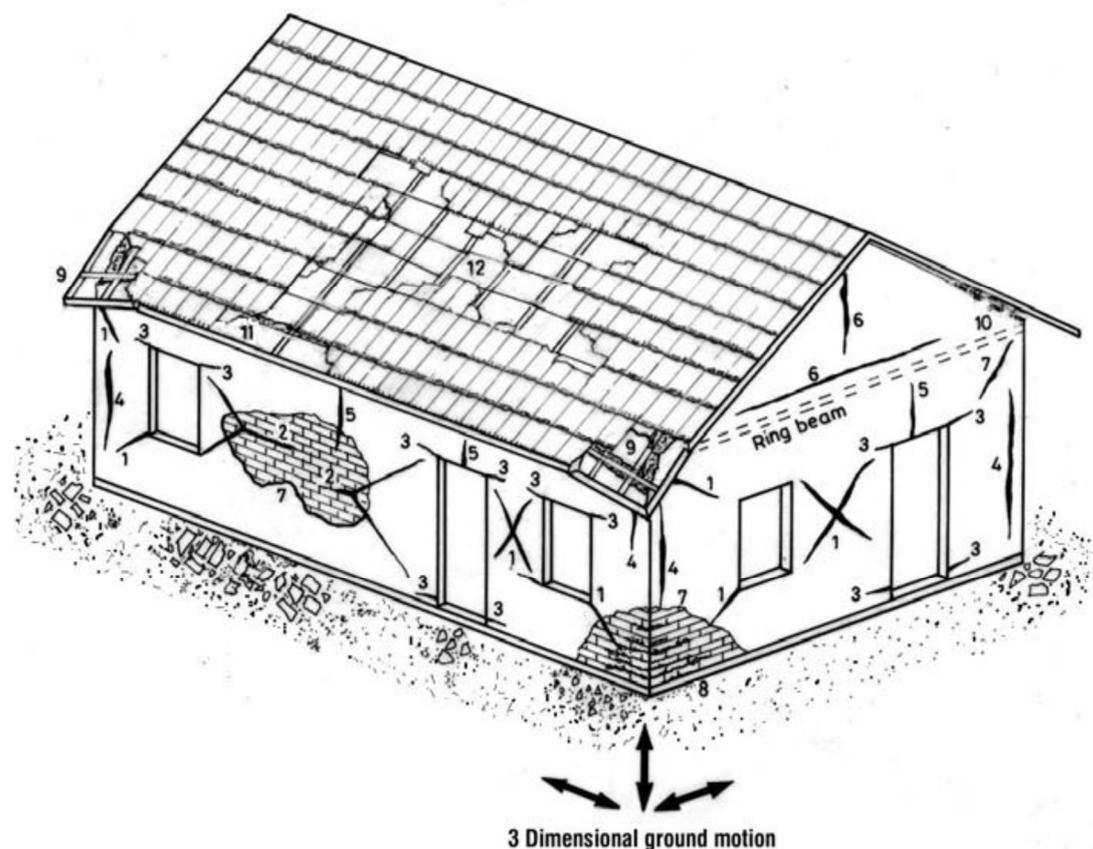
Typical damages in a masonry building (according to www.earth-auroville.com/index.php)
